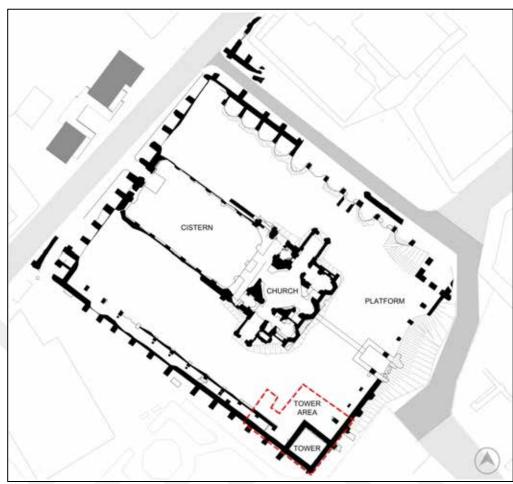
Site plan of Küçükyalı, showing the elevated platform with church, cistern, tower and tower area [KYAP 2015, with additions by the author].
